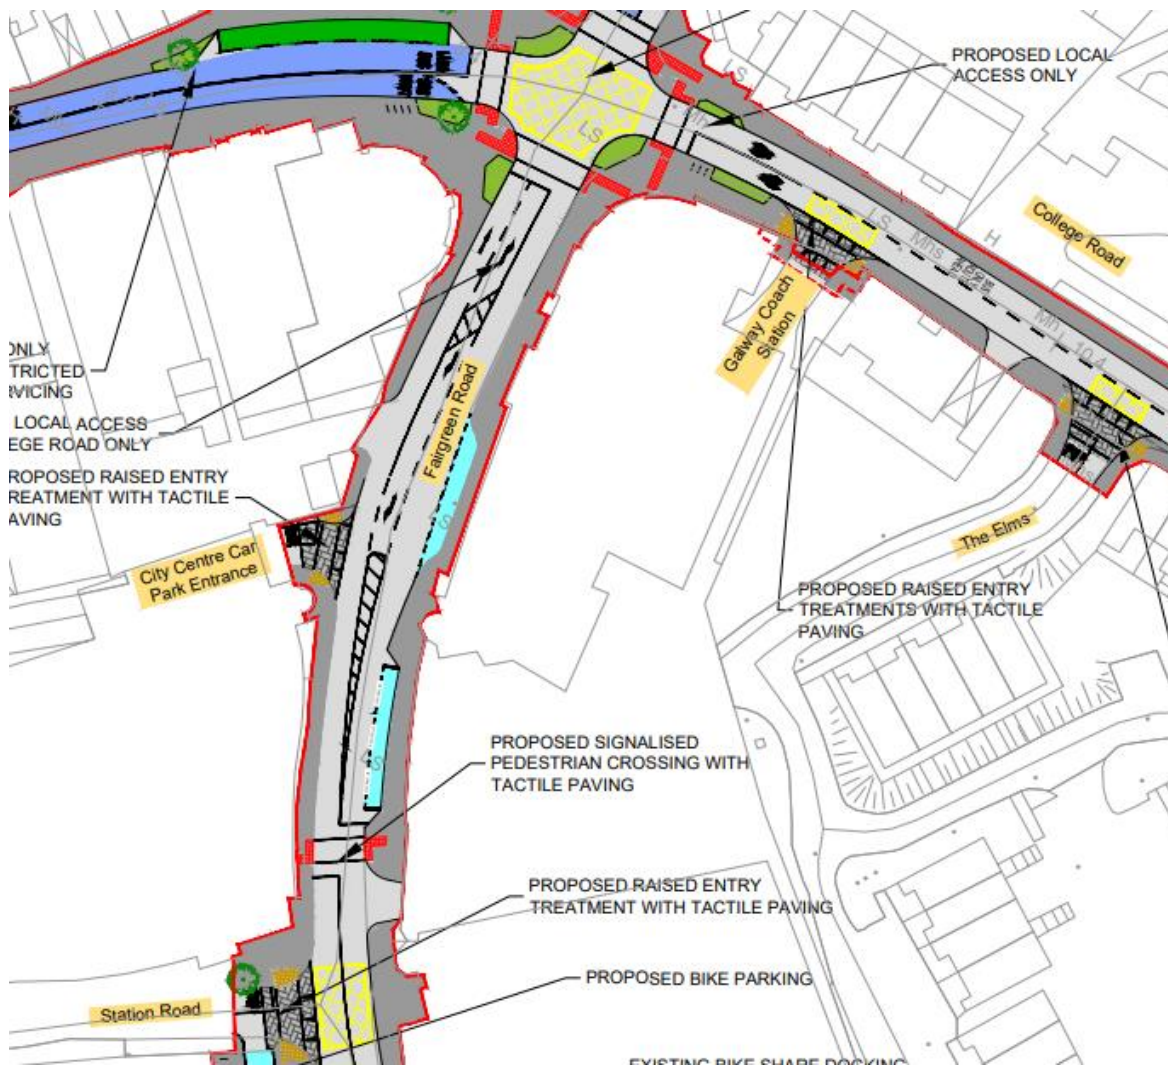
General Arrangement of Proposed Scheme at Fairgreen Coach Station and Fairgreen House
